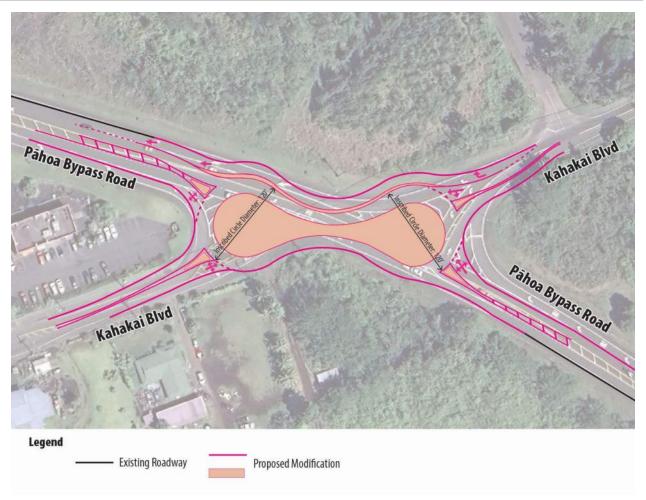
Pāhoa Bypass Road and Kahakai Boulevard Conceptual Roundabout
